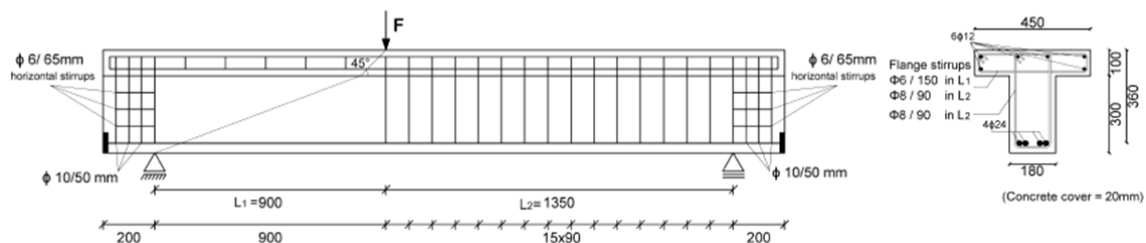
Tested beams: geometry, steel reinforcements applied in all beams (dimensions in mm) (Breveglieri et al. 2014)
